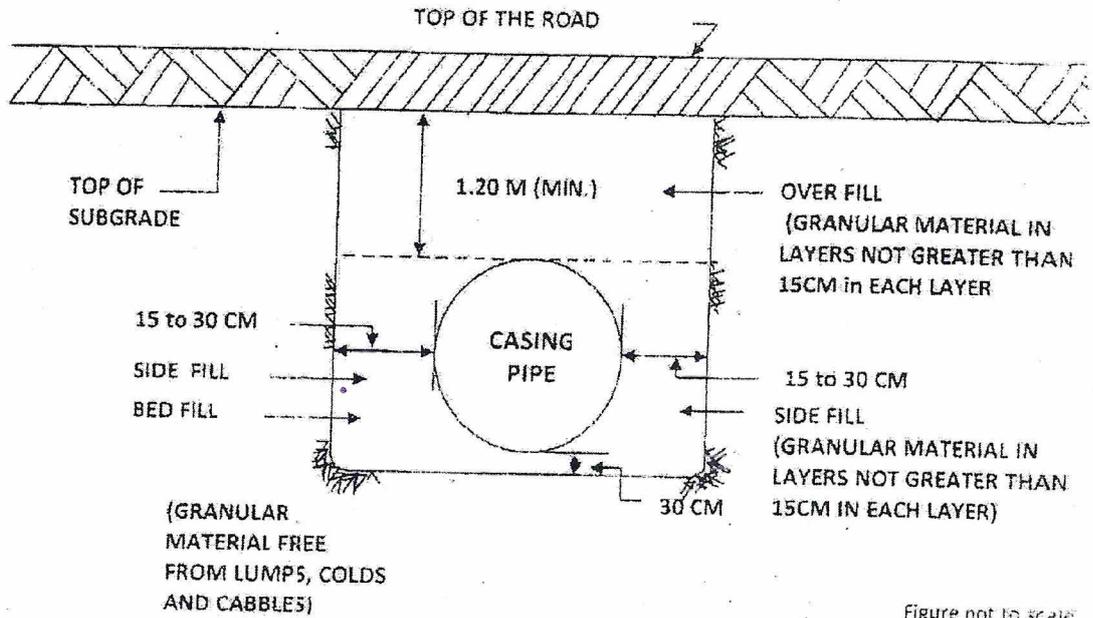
INSTALLATION OF CASING PIPE FOR CROSSING THE ROAD
